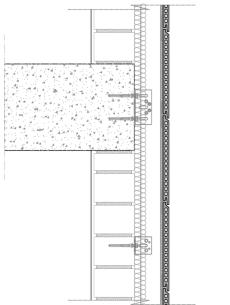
Vertical section. Faveton® SAH Ceram 20.
